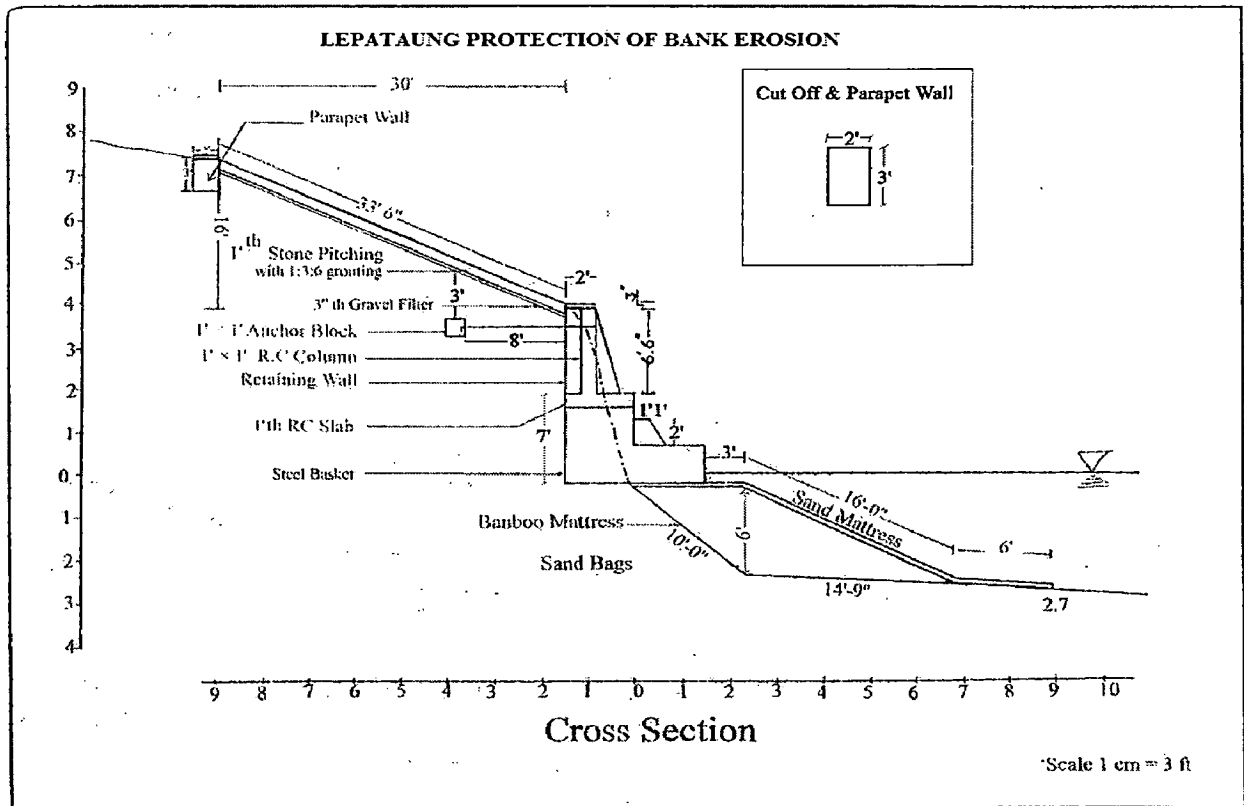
Cross-Section in front of Structure(45ft) at Lepataung waterway
